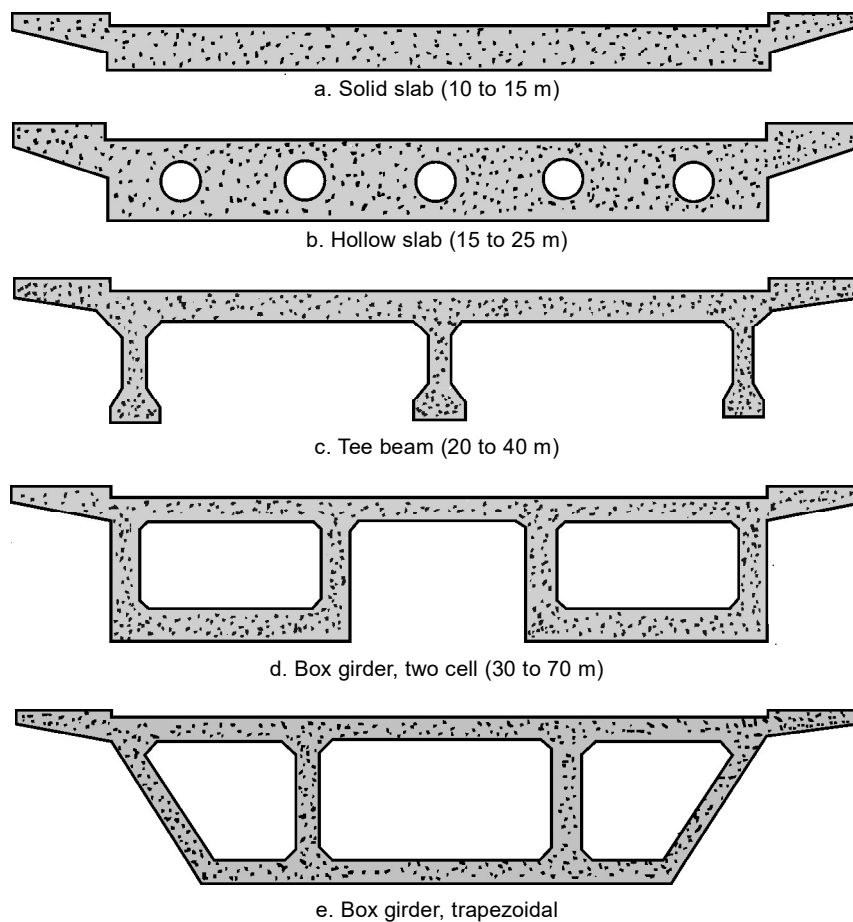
Post-tensioned prestressed concrete bridge decks
